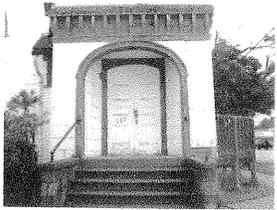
Main Entrance located in South, West corner of Bell Tower on Center St. Rotten wood over doors on eaves, peeling paint, missing siding, water damaged doors.
